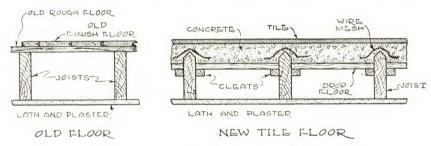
Illustration Showing Changes Required for Tile Floor in a Bathroom
